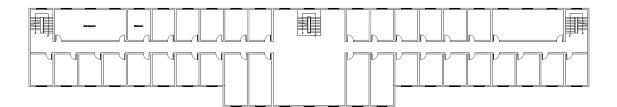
The floor plan of a large pension facility in Shenyang (Drawn by the author)
